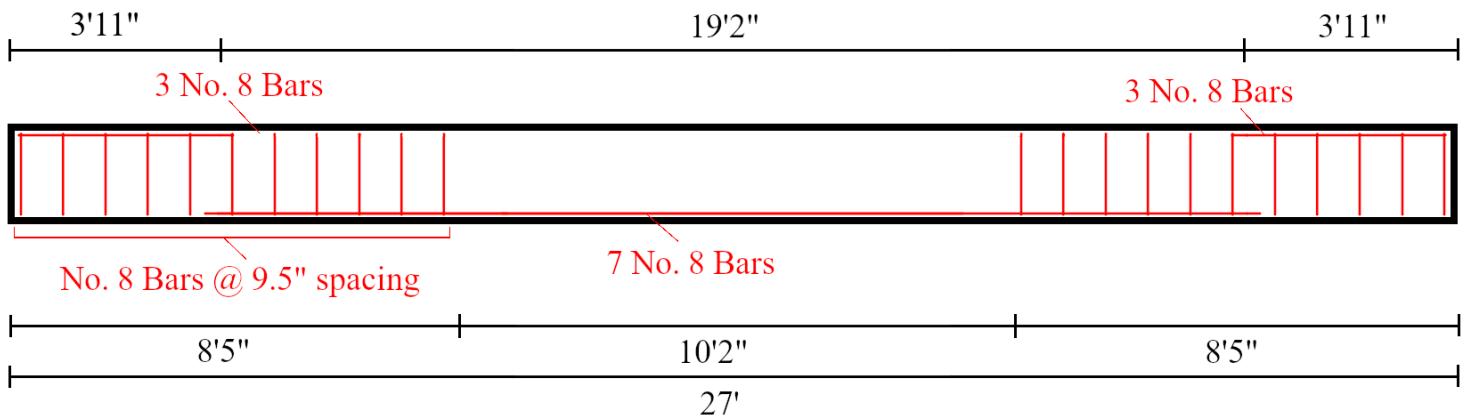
Bar rebar schedule, profile view, overlap top and bottom longitudinal reinforcement 1 foot
